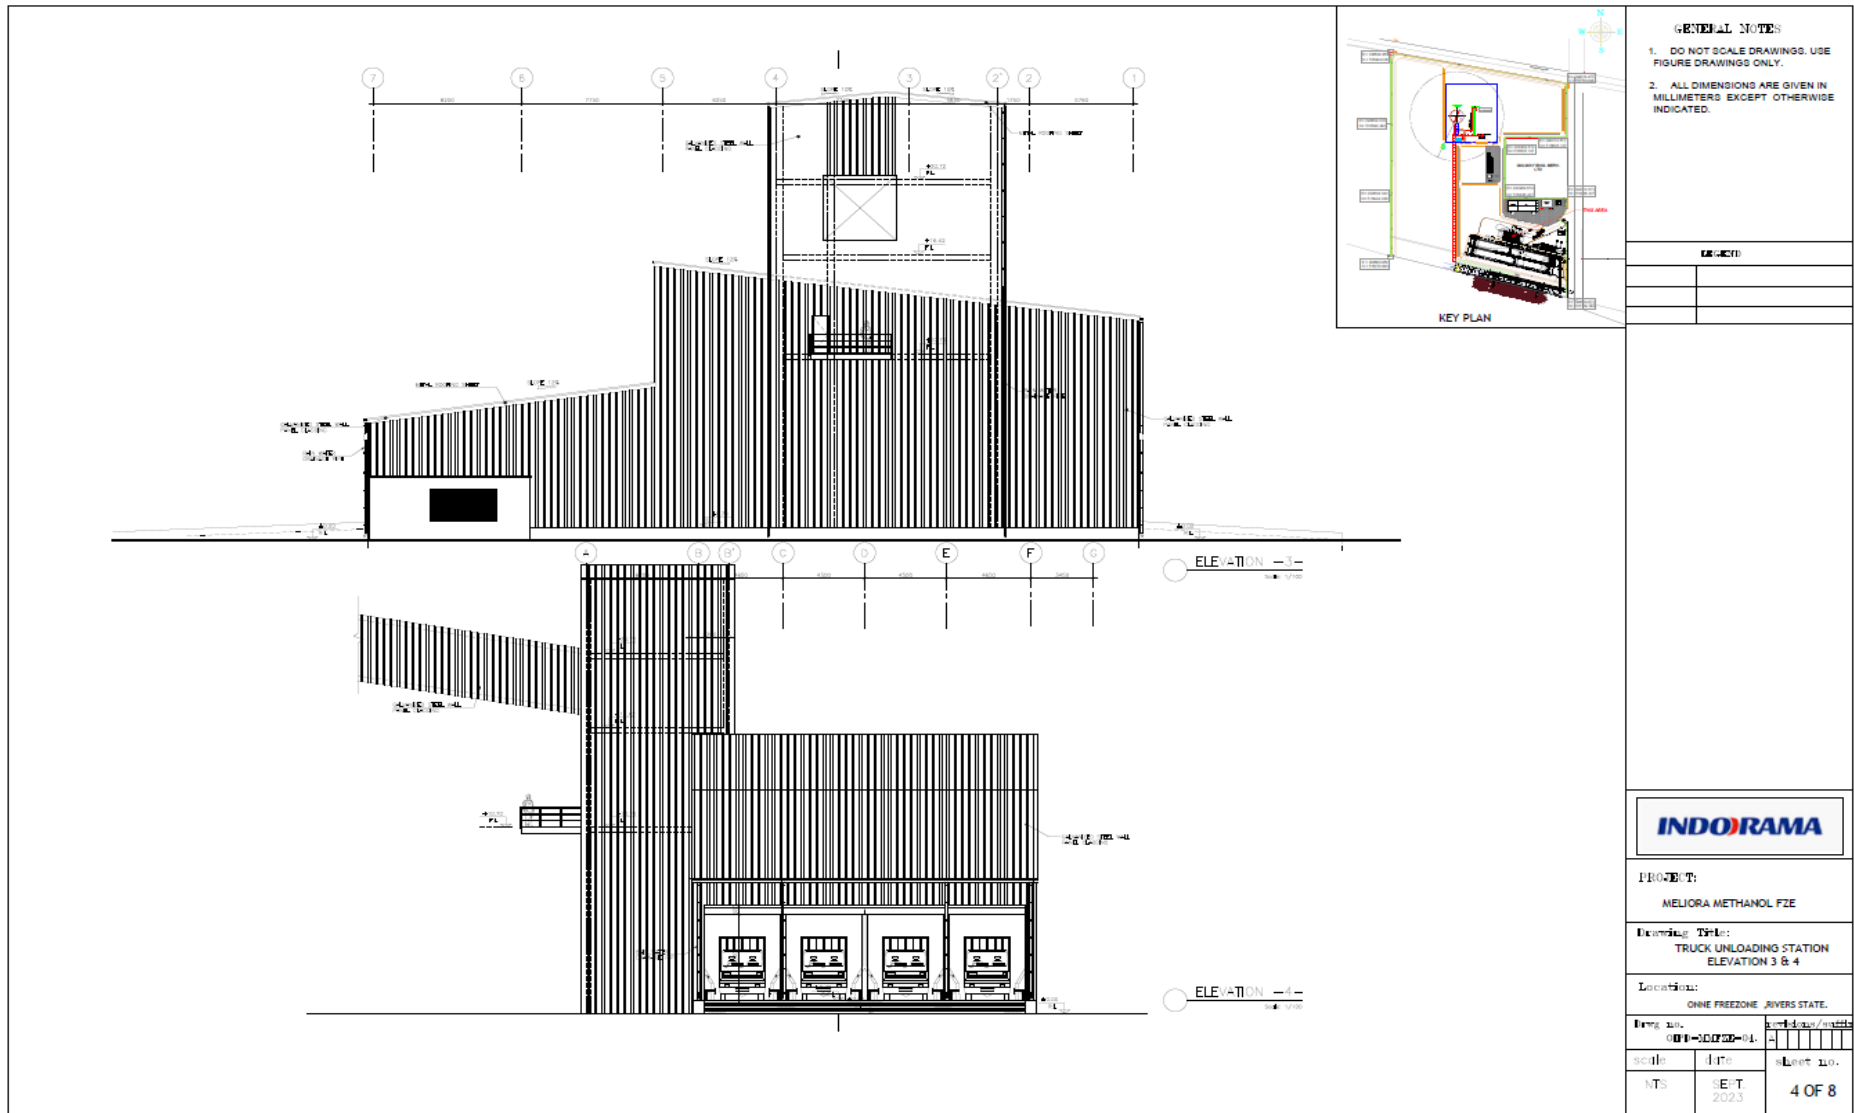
Truck Unloading Station Elevation 3 and 4
